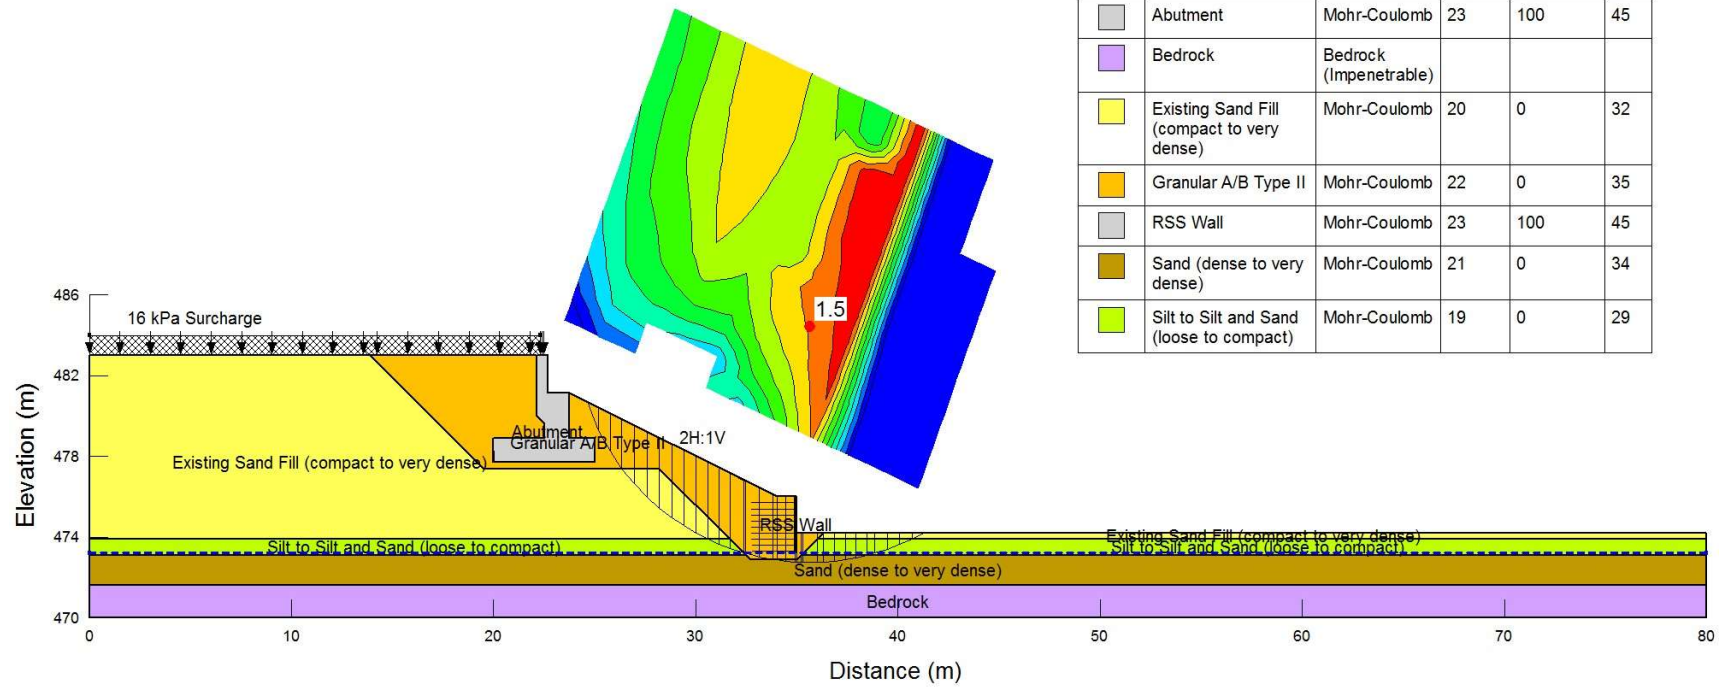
Slope stability Analysis for RSS Wall in Front of North Abutment Forward Slope – Drained Seismic Conditions
